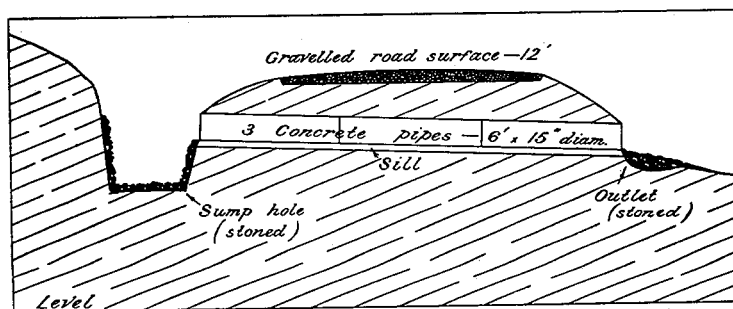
Diagrammatic cross-section of a pipe culvert.
